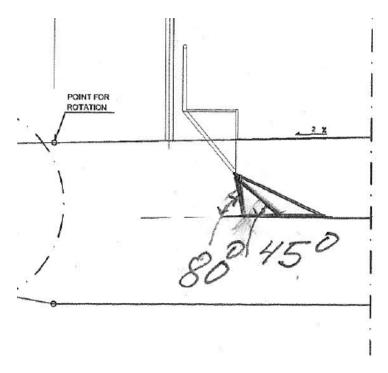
Modified railway girder configurations – 45° and 80° rail girder edge (detail).
